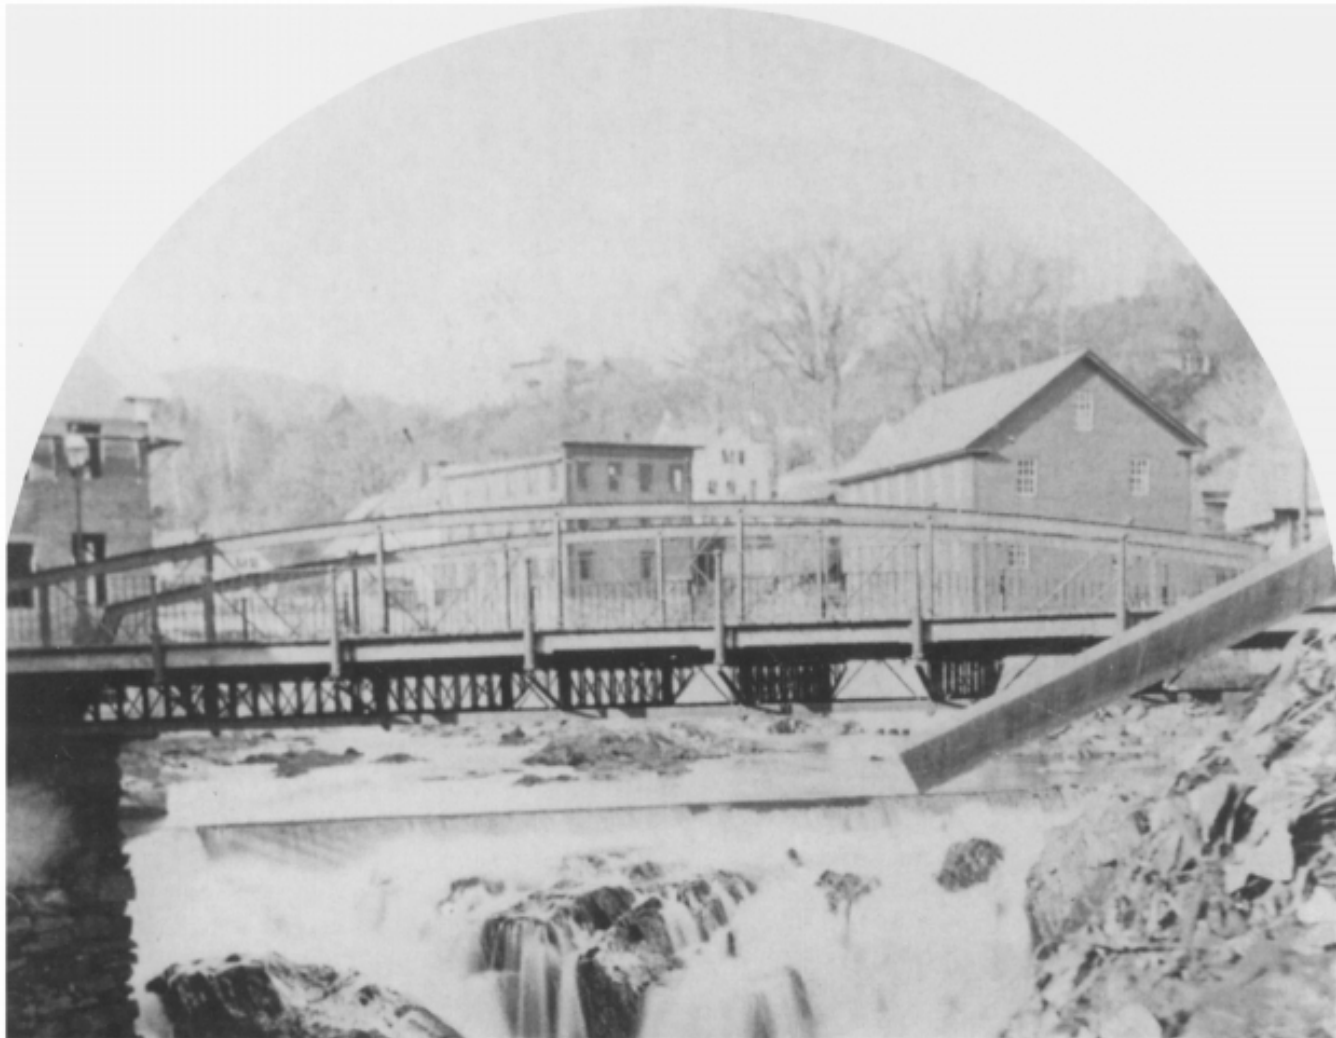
The bridge formerly at Springfield, Vermont. A rare view that shows the transverse trusses that carried the floor in wider trusses. These rested on the bottom chords next to the web posts and cantilever to carry sidewalks outside the roadway.
